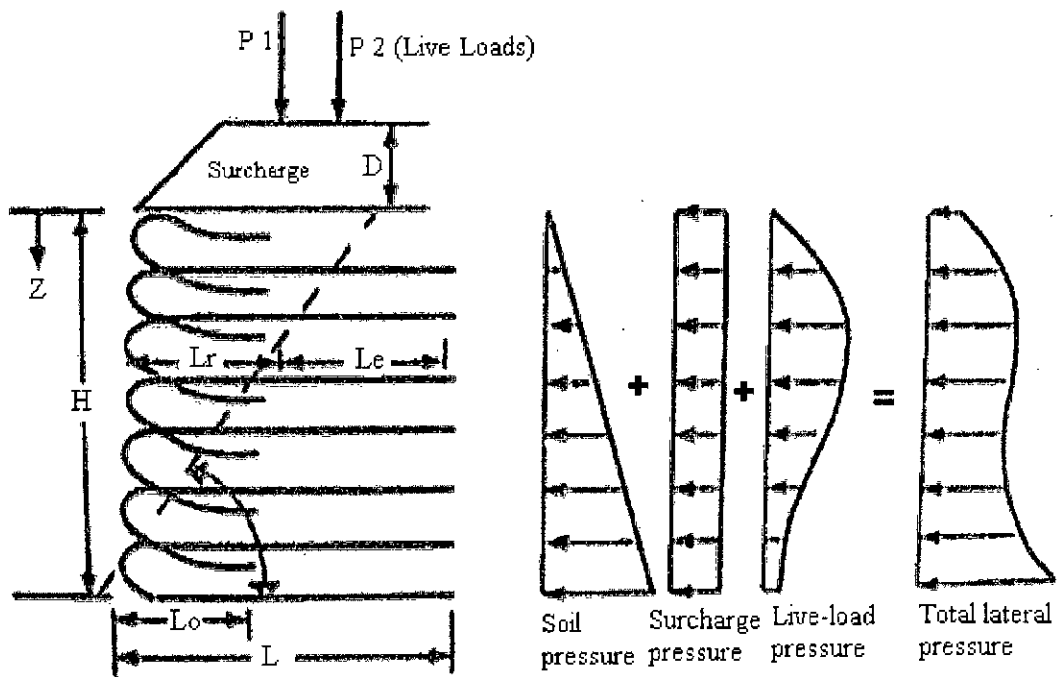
Earth pressure concepts and theory for geotextile walls (after Koerner, 1997)
